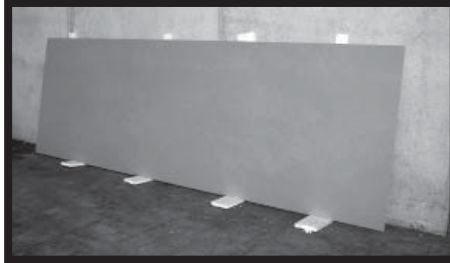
For upright storage, place the long side of the slab on wooden planks.
